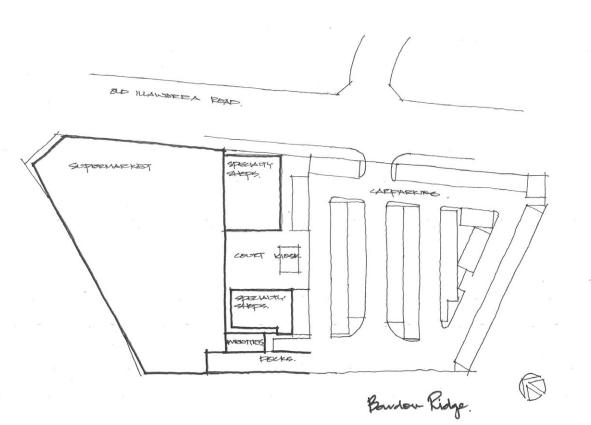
LAYOUT OPTION B D+R ARCHITECTS
